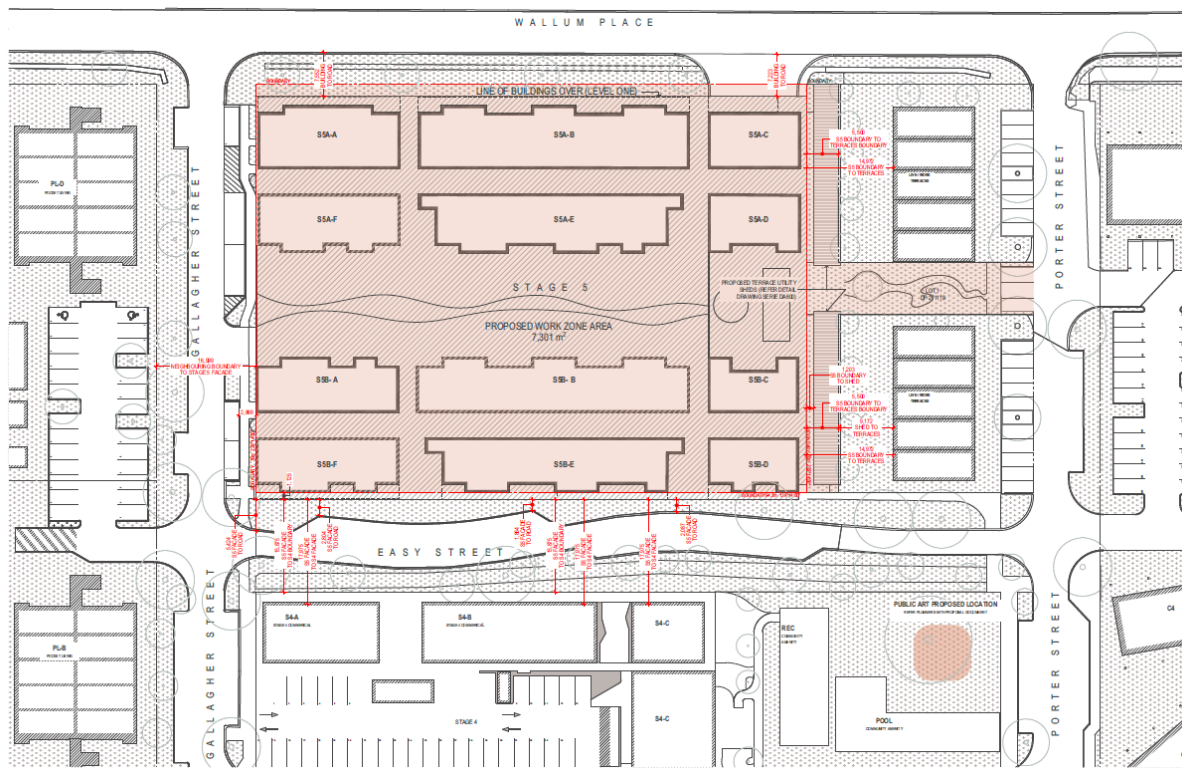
Site layout plan. Proposed "work zone area" highlighted in orange.
